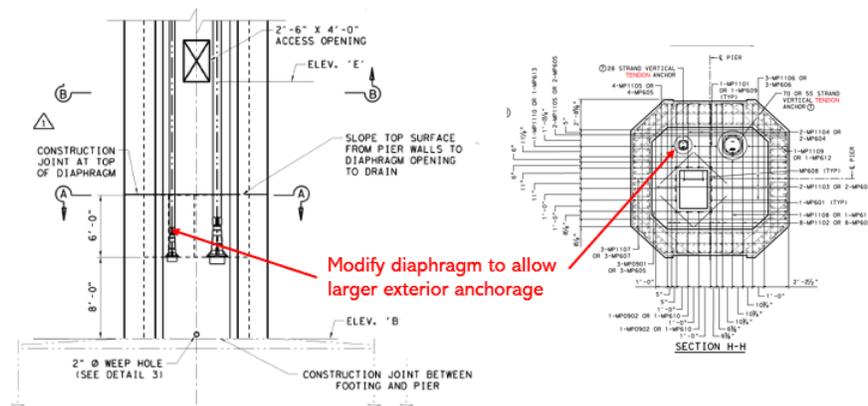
| Modifications will be required to the already built transition pier diaphragm
